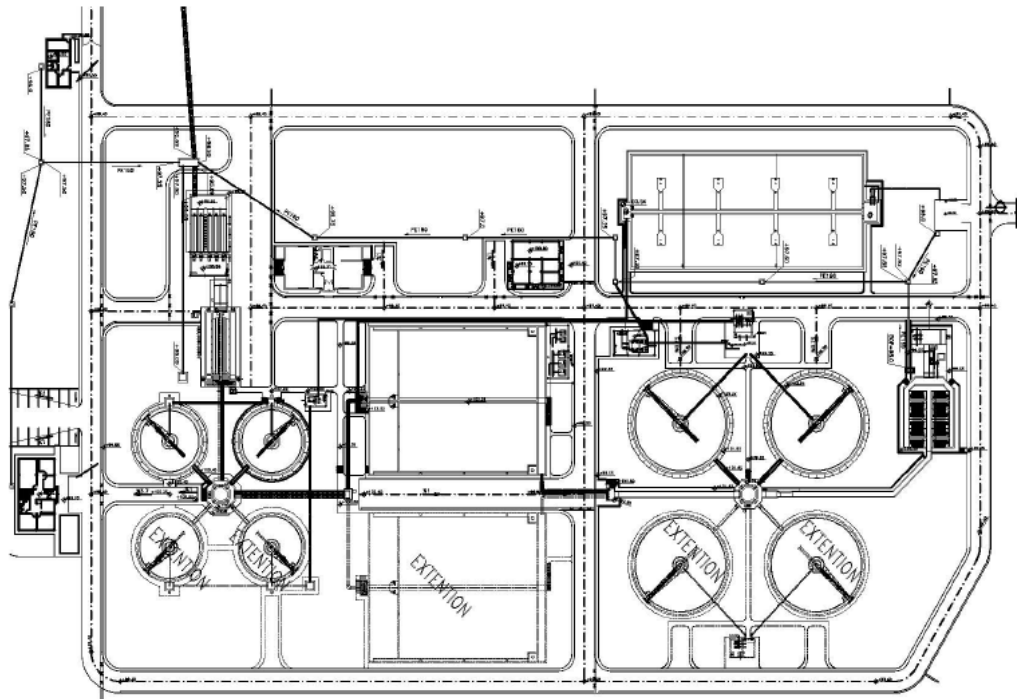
Baharestan wastewater treatment plant Layout (Contractor documents)
